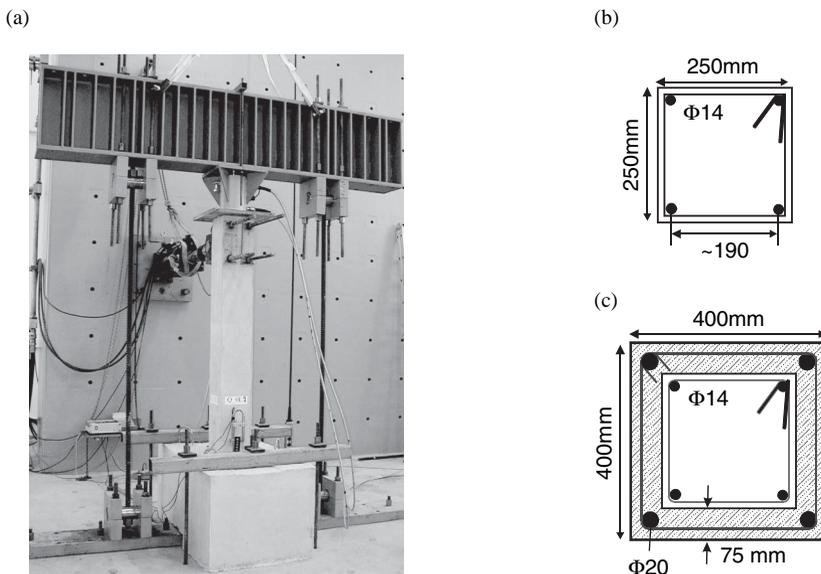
Test setup (a) and cross section of original (b) and of RC-jacketed column (c) — dimensions are in mm.
